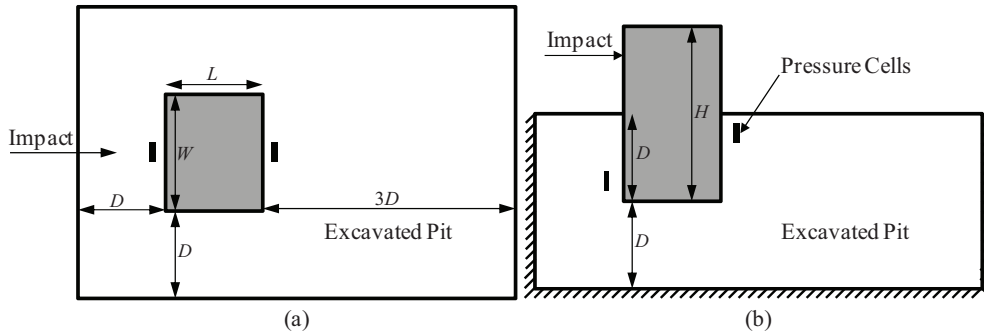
General layout for field test configuration: (a) plan view; and (b) elevation view (Dimension of excavated pit to scale, Dimension of boulder is not to scale)
